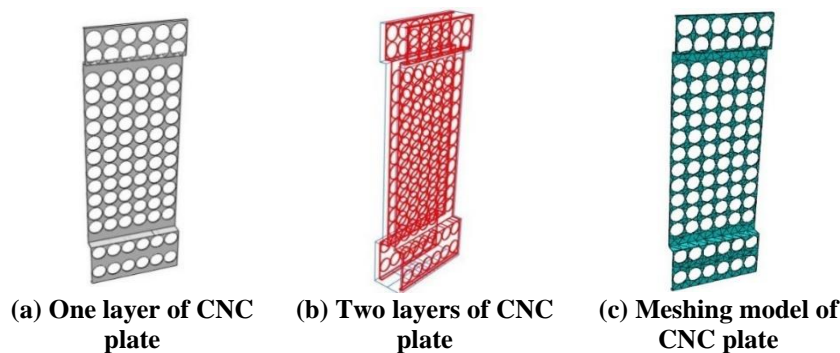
Creating FE model of new RC wall model with CNC steel plate.
